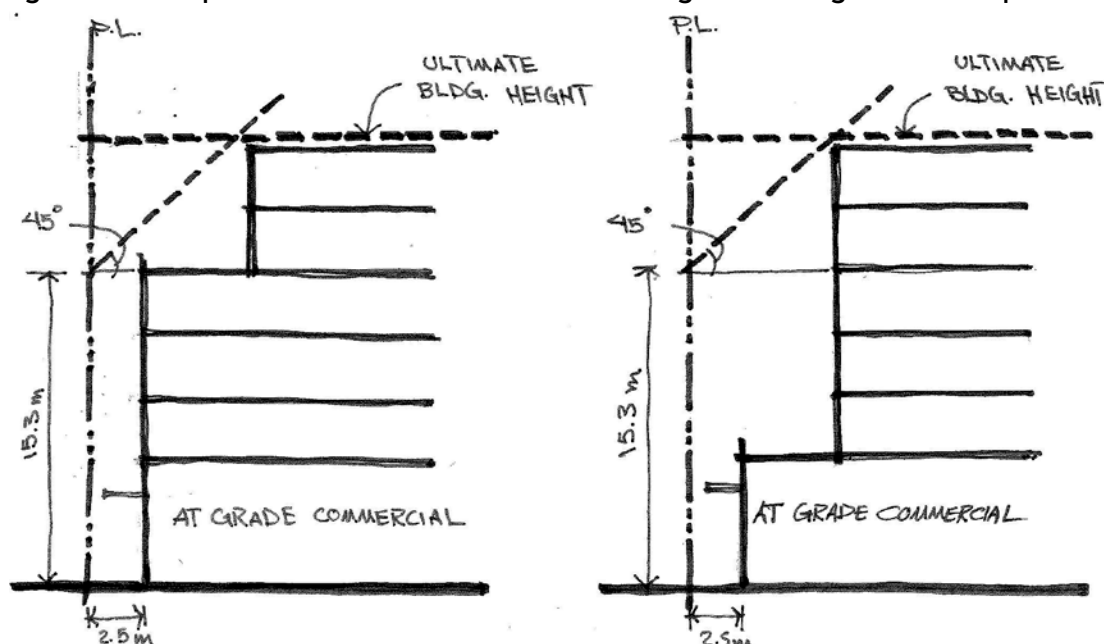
Allowable building envelope where 45 degree building chamfer requirement does not apply
